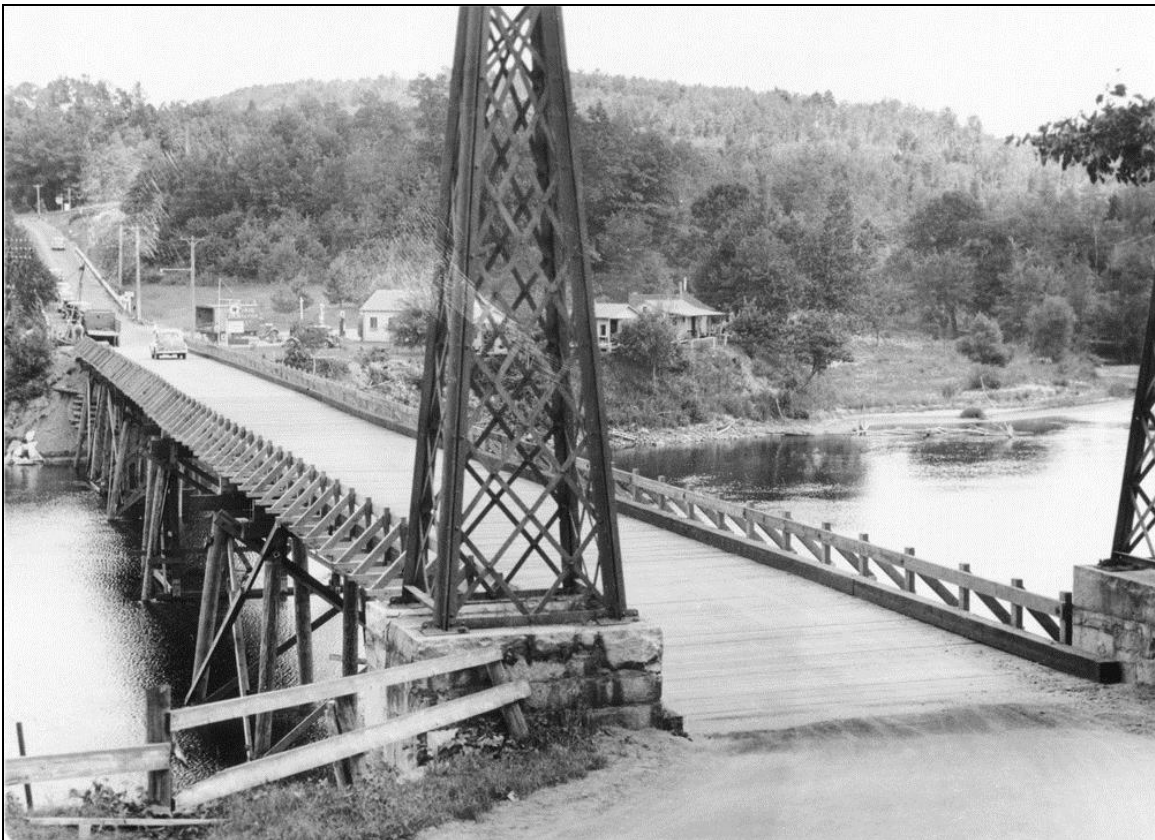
Photo, 1937, showing temporary wood trestle bridge erected between towers of suspension bridge destroyed by 1936 flood (NHDOT 1941).
